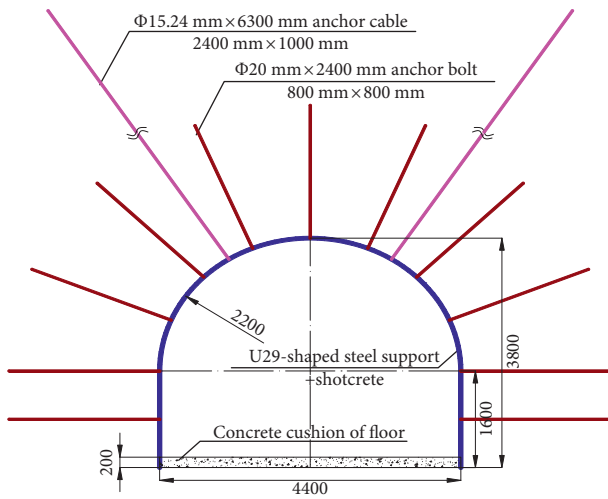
The combined support of the lower roadway “bolt + cable + U-shaped steel support passive reinforcement + shotcrete”.
